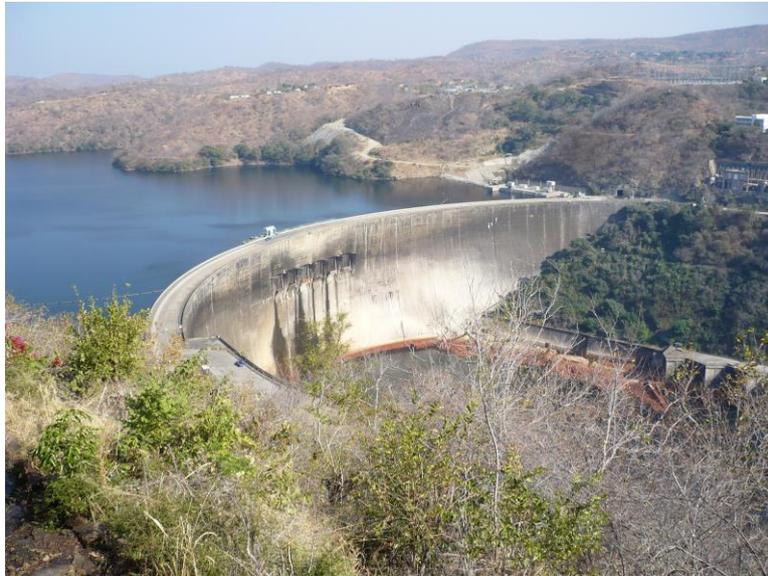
Kariba Dam wall (Photo by Wilson Mhlanga)
